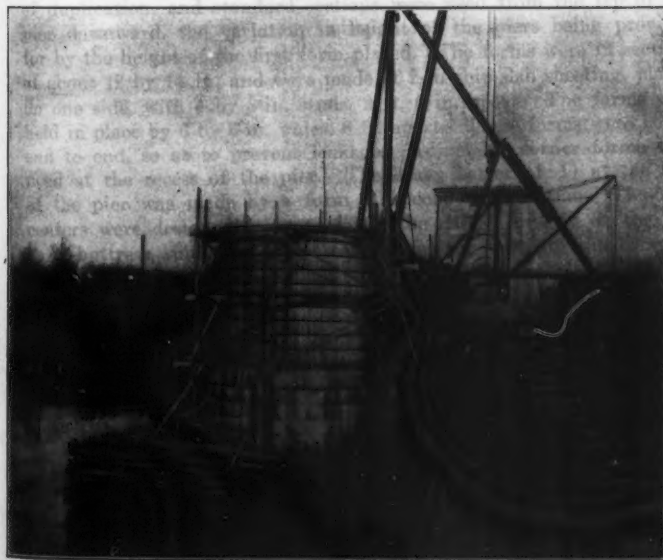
PIERS FOR LITTLE HELL GATE BRIDGE PROTECTED BY HEAVY CRIB COFFER-DAMS.
